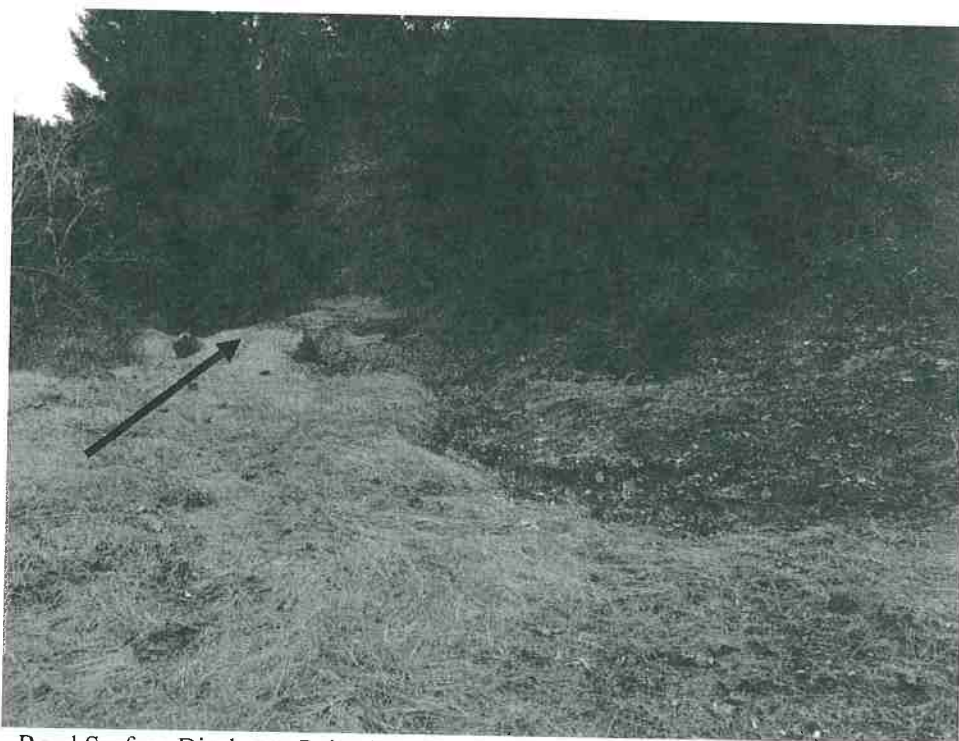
, MP #1 – Road Surface Discharge Point (RSDP) #1- View of a gully on Road 3 between Stream Crossing (SC) #3 and the cutbank spring at the landing, which is causing the road surface erosion due to the lack of drainage features.
